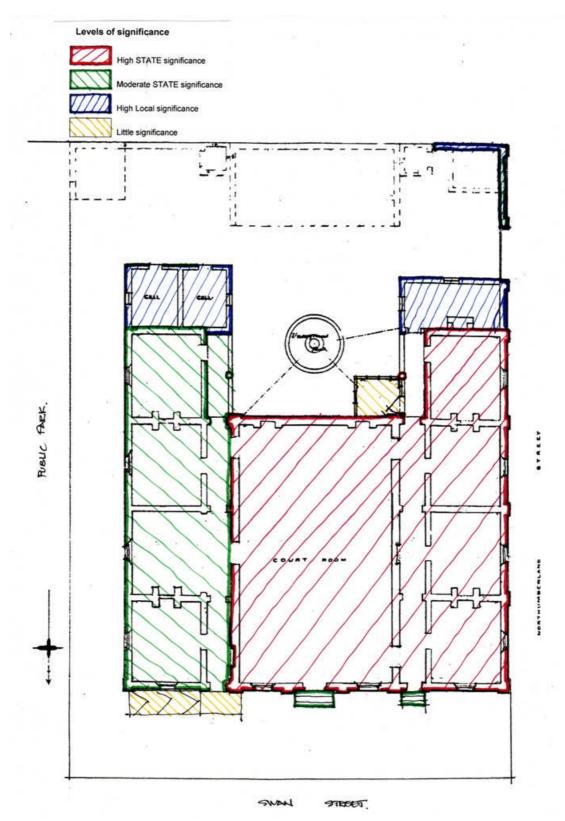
Plan showing general areas of significance of the building. (J. Carr)
